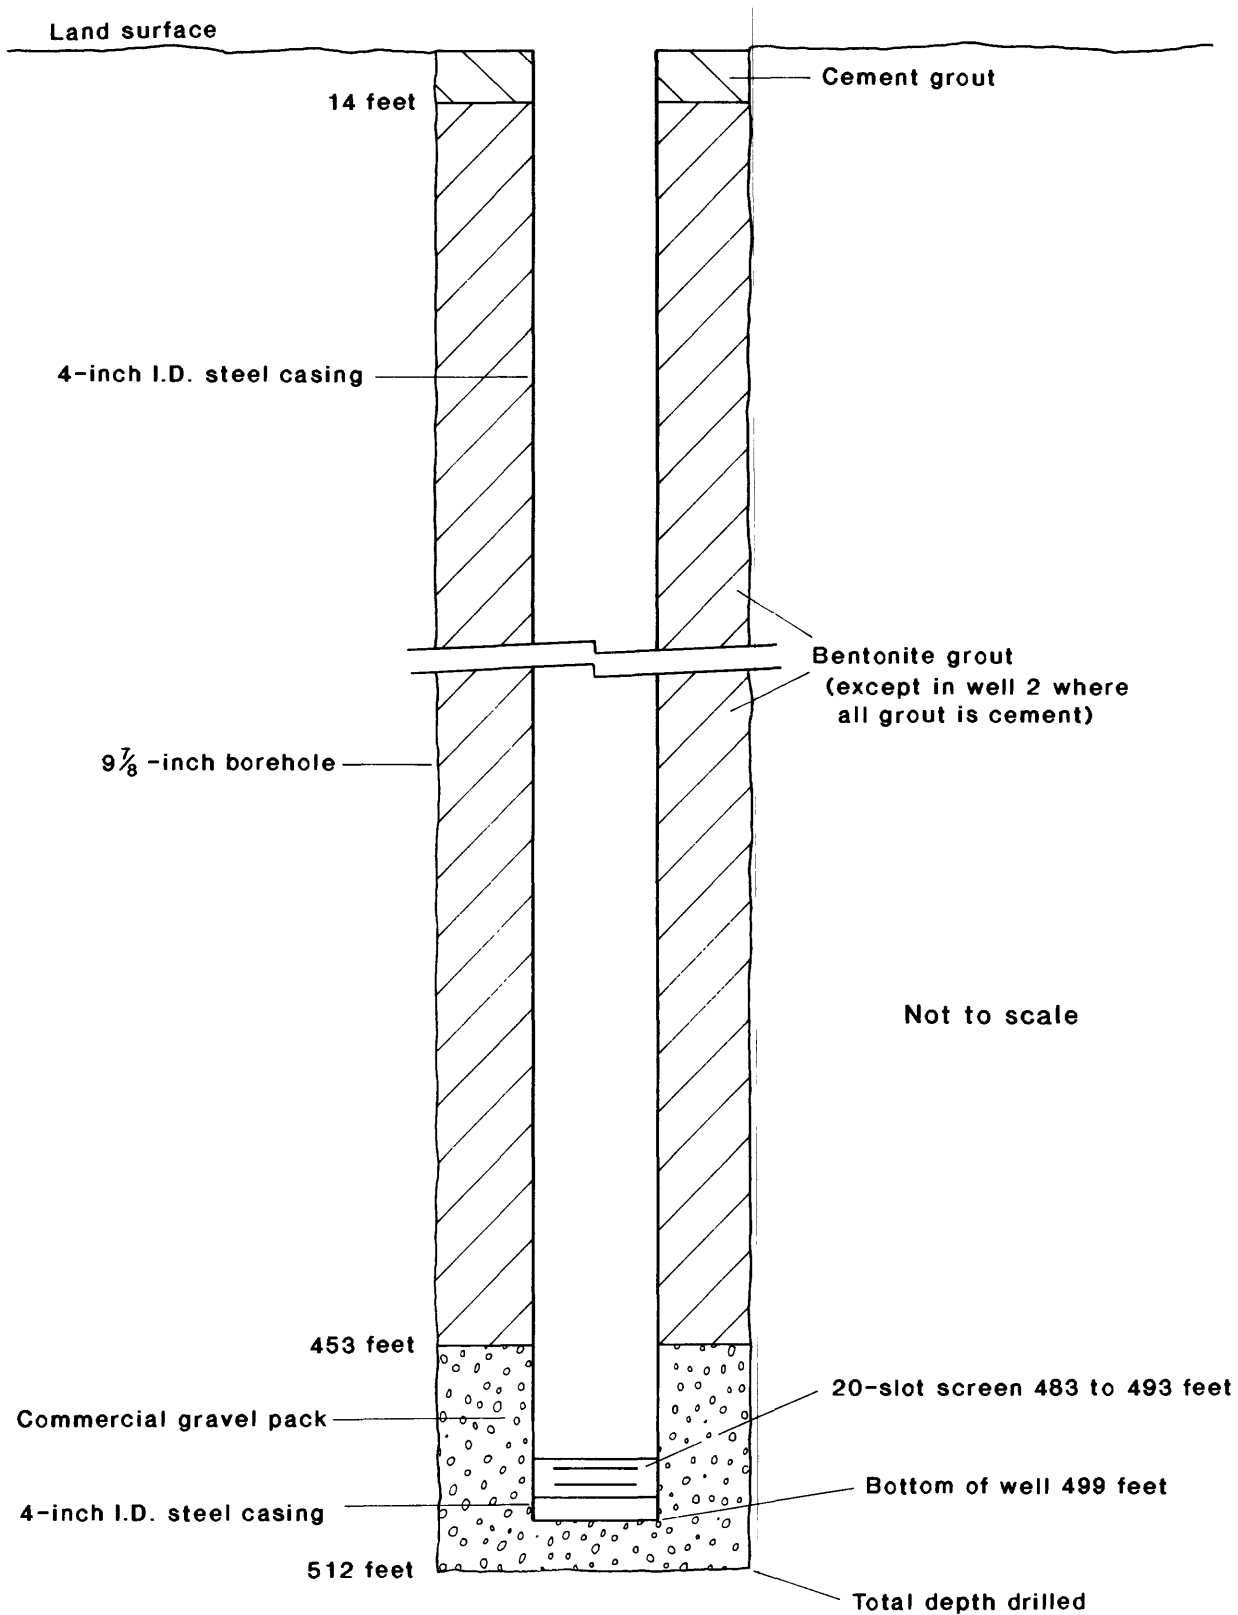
Construction details of well 4, showing method of installation of wells 2, 3, 4, and 5.
